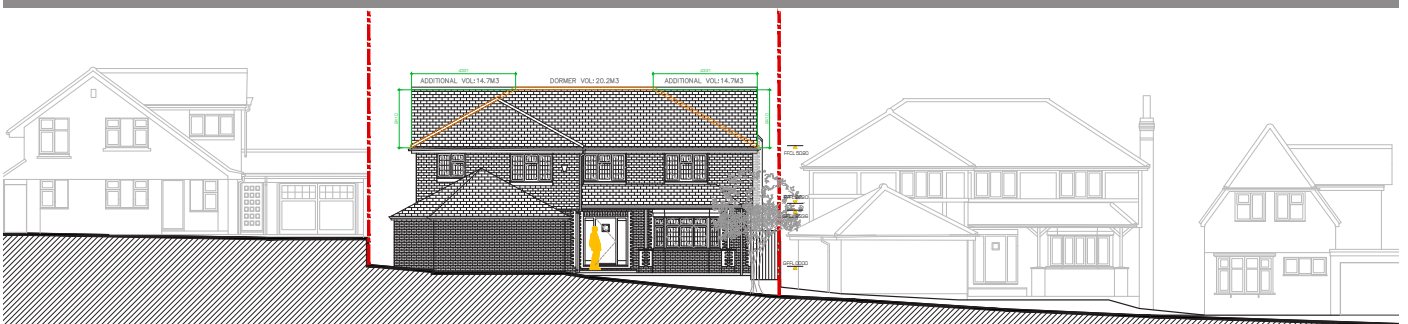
Application 22/01690/LDCP Proposed Front Elevation
